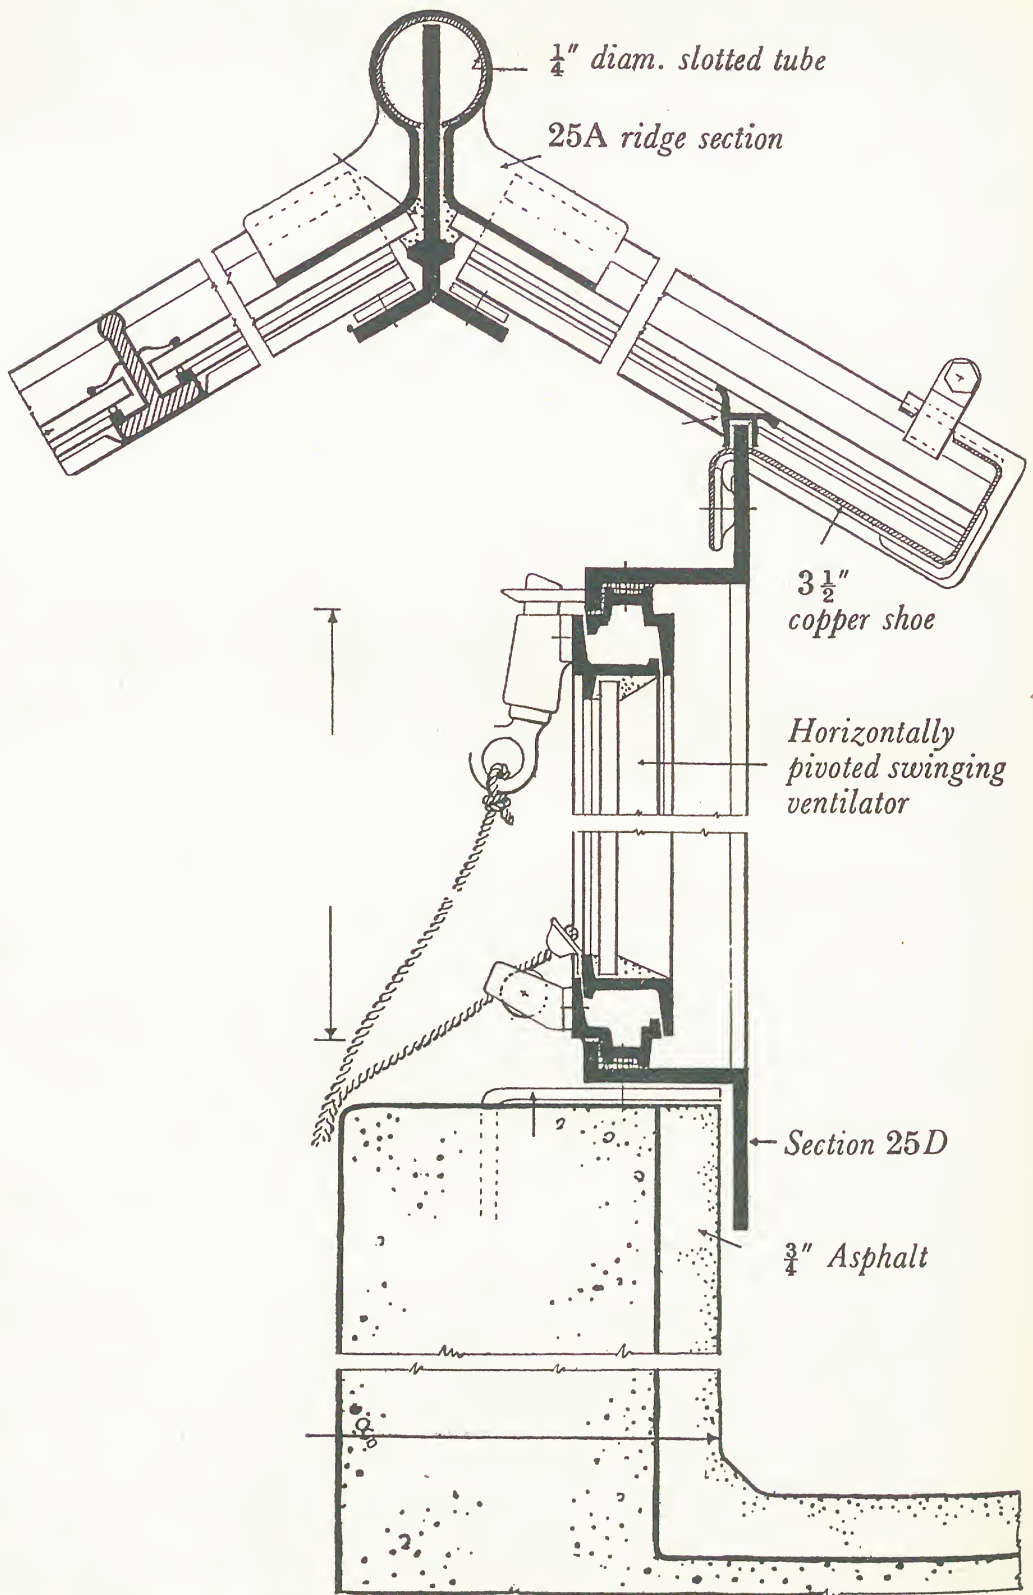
Detail section of lantern light showing fixing to concrete kerb. (Courtesy of Henry Hope & Sons, Ltd.)
